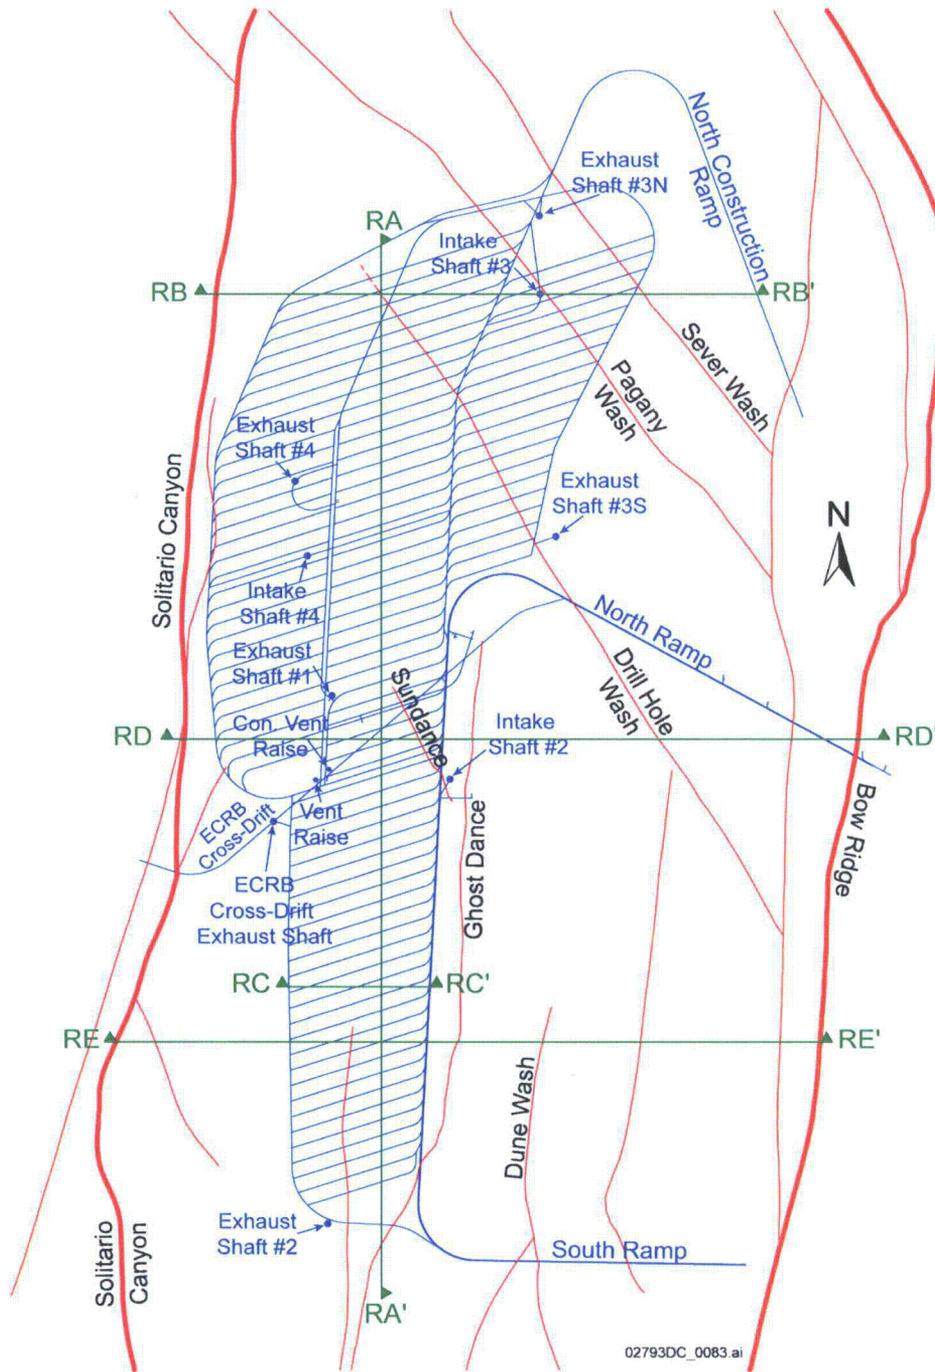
Underground Layout Configuration and Fault Traces at the Emplacement Level
